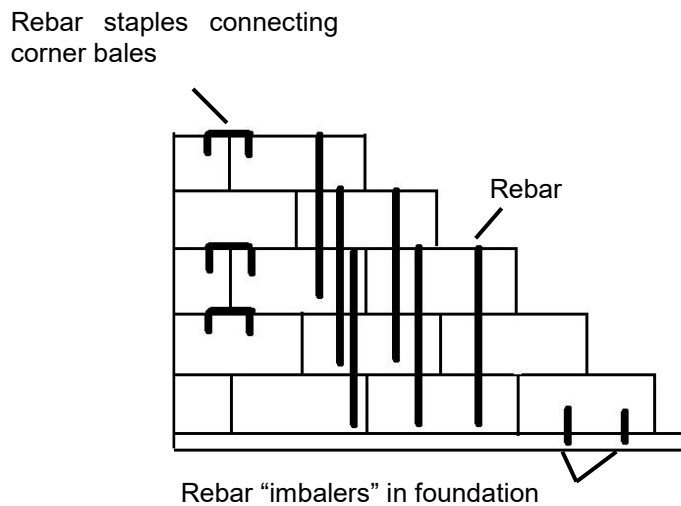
Pinning system for loading bearing straw bale walls with 3 tie bales laid flat. (Myhrman, 1998).
